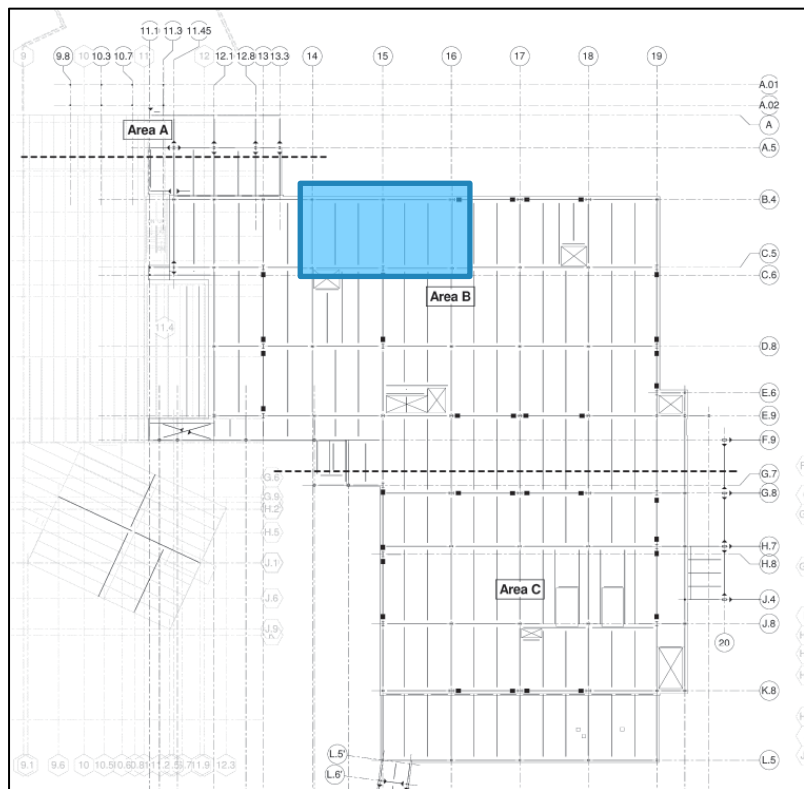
Plan view of the addition's structure. The area being analyzed can be seen calling out on the east elevation, column lines 14, 15, and 16 along column B.4. Image courtesy of Ellerbe Becket.
